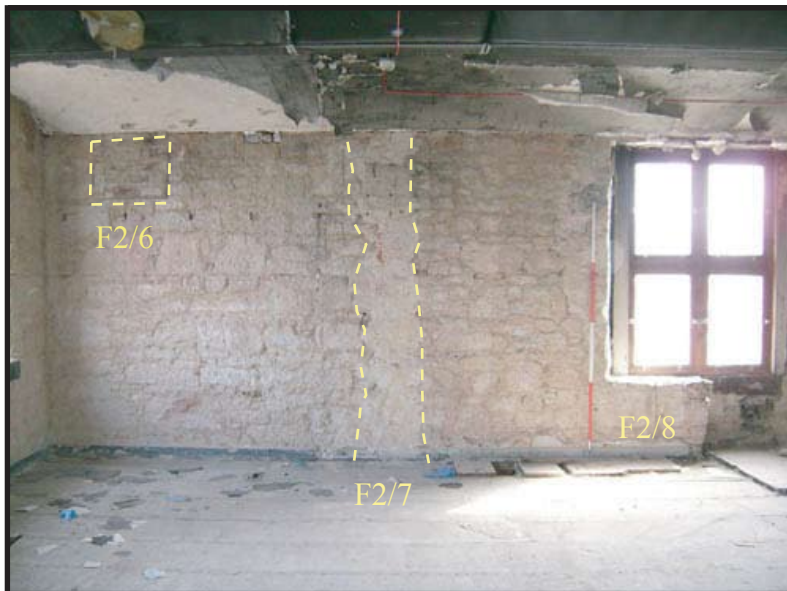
North side of the east wall on the second floor showing window F2/8, brick flue F2/7 and bricked-up bearing box F2/6
